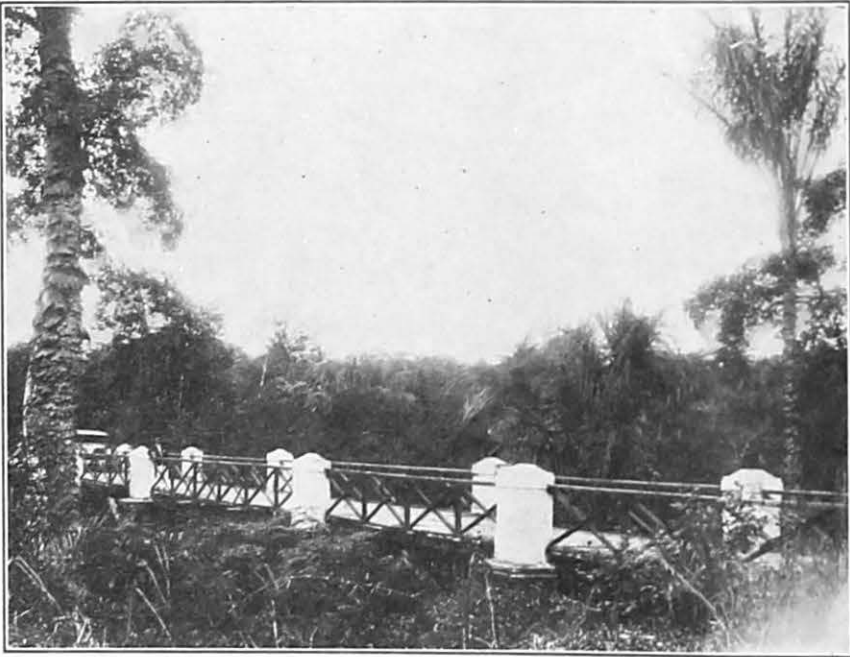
Wooden highway bridge on concrete piles, near Manaus, Amazonas
